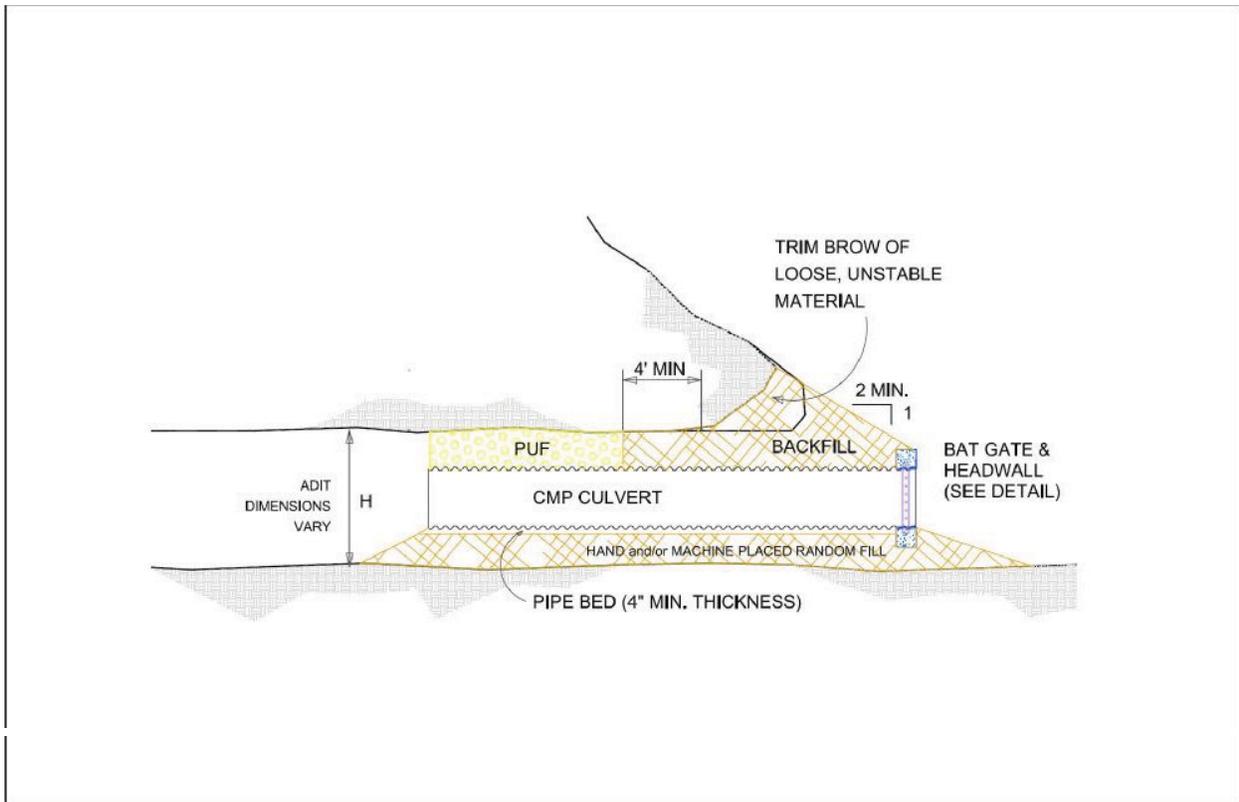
Recommended plans and details for culvert closures for MHP Adit 01 and Adit 09. Gates should be constructed of angle-iron, or 1 inch square stock steel.
